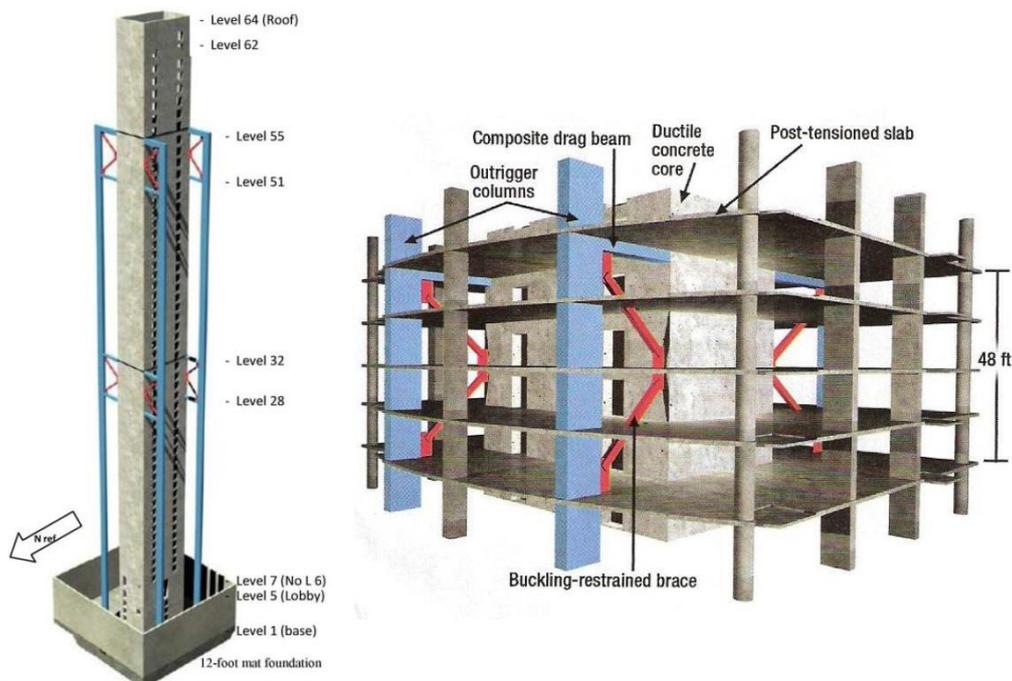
One Rincon Hill Tower structural system (Huang *et al.* 2012)
